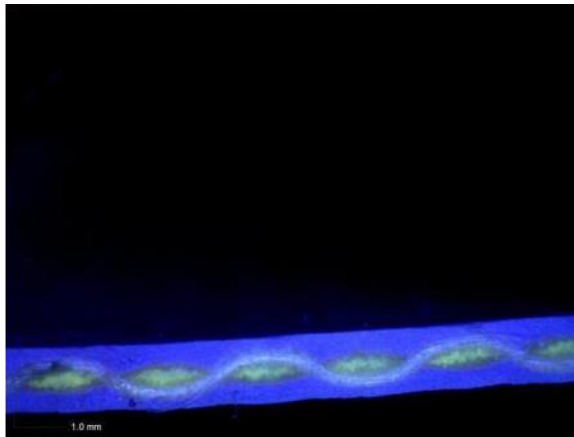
Shingle overlap weld with two interior scrim exposed panels – dye penetration in both
